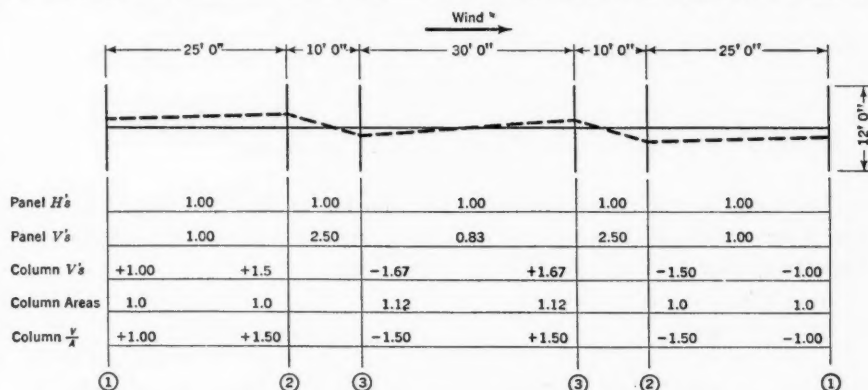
TYPICAL FLOOR, SHOWING RELATIVE MOVEMENT OF JOINTS DUE TO AXIAL COLUMN DEFORMATION.
